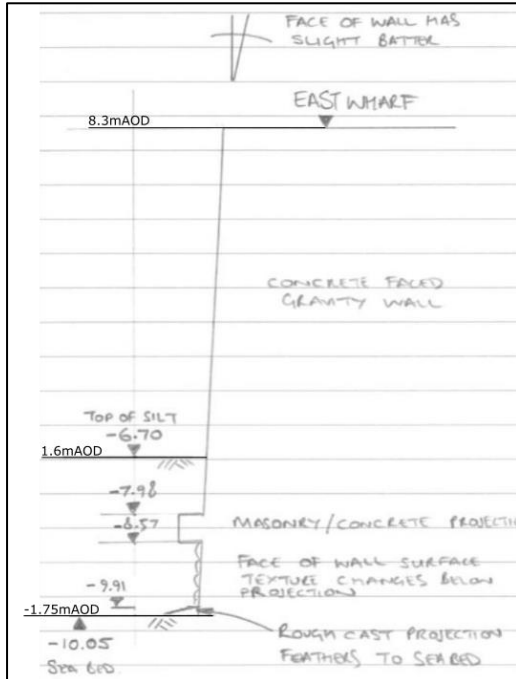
Indicative Cross-Section through Central Section of Harbour Wall
